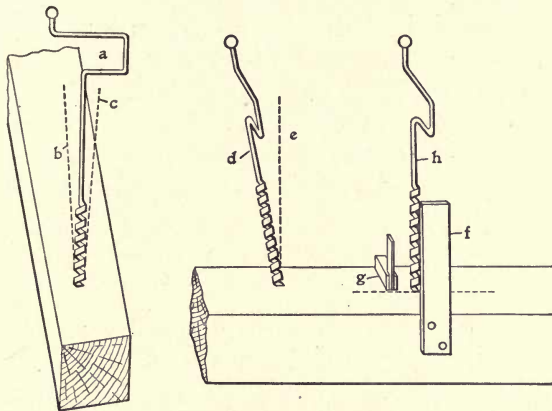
BORING "STRAIGHT" BOLT HOLES.
